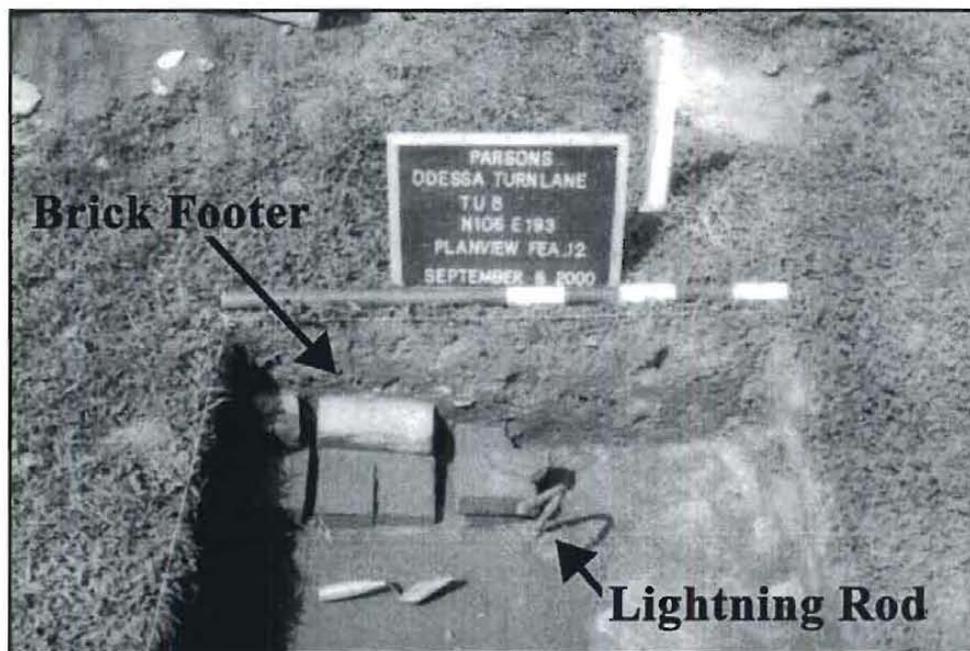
Brick Footers (Feature 12) for the South Side Porch on the Kielkopf House
